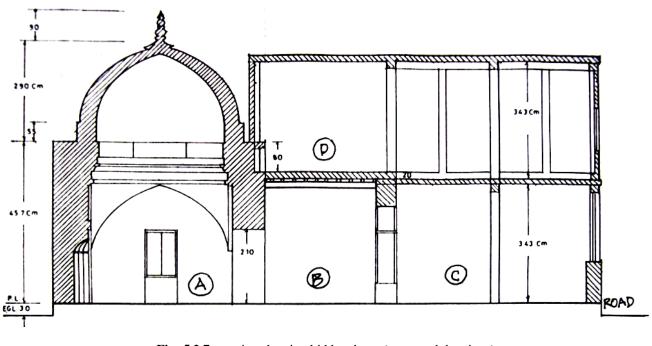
section showing hidden dome (measured drawings) A. Original Structure B. First extension- Veranda C. Enlargement up to the Road D. Addition of upper floor
